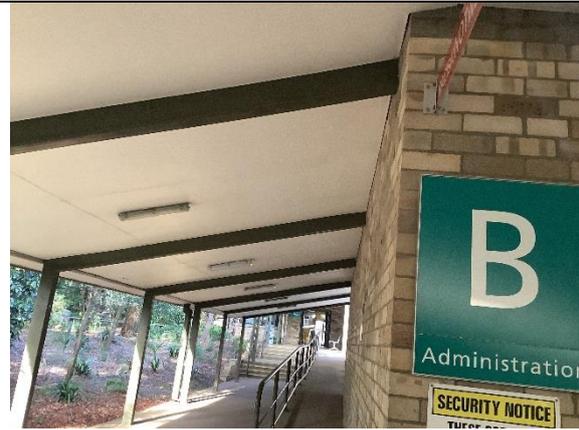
Building B – B.G.3 – Throughout – Awning – Fibre Cement Sheet
